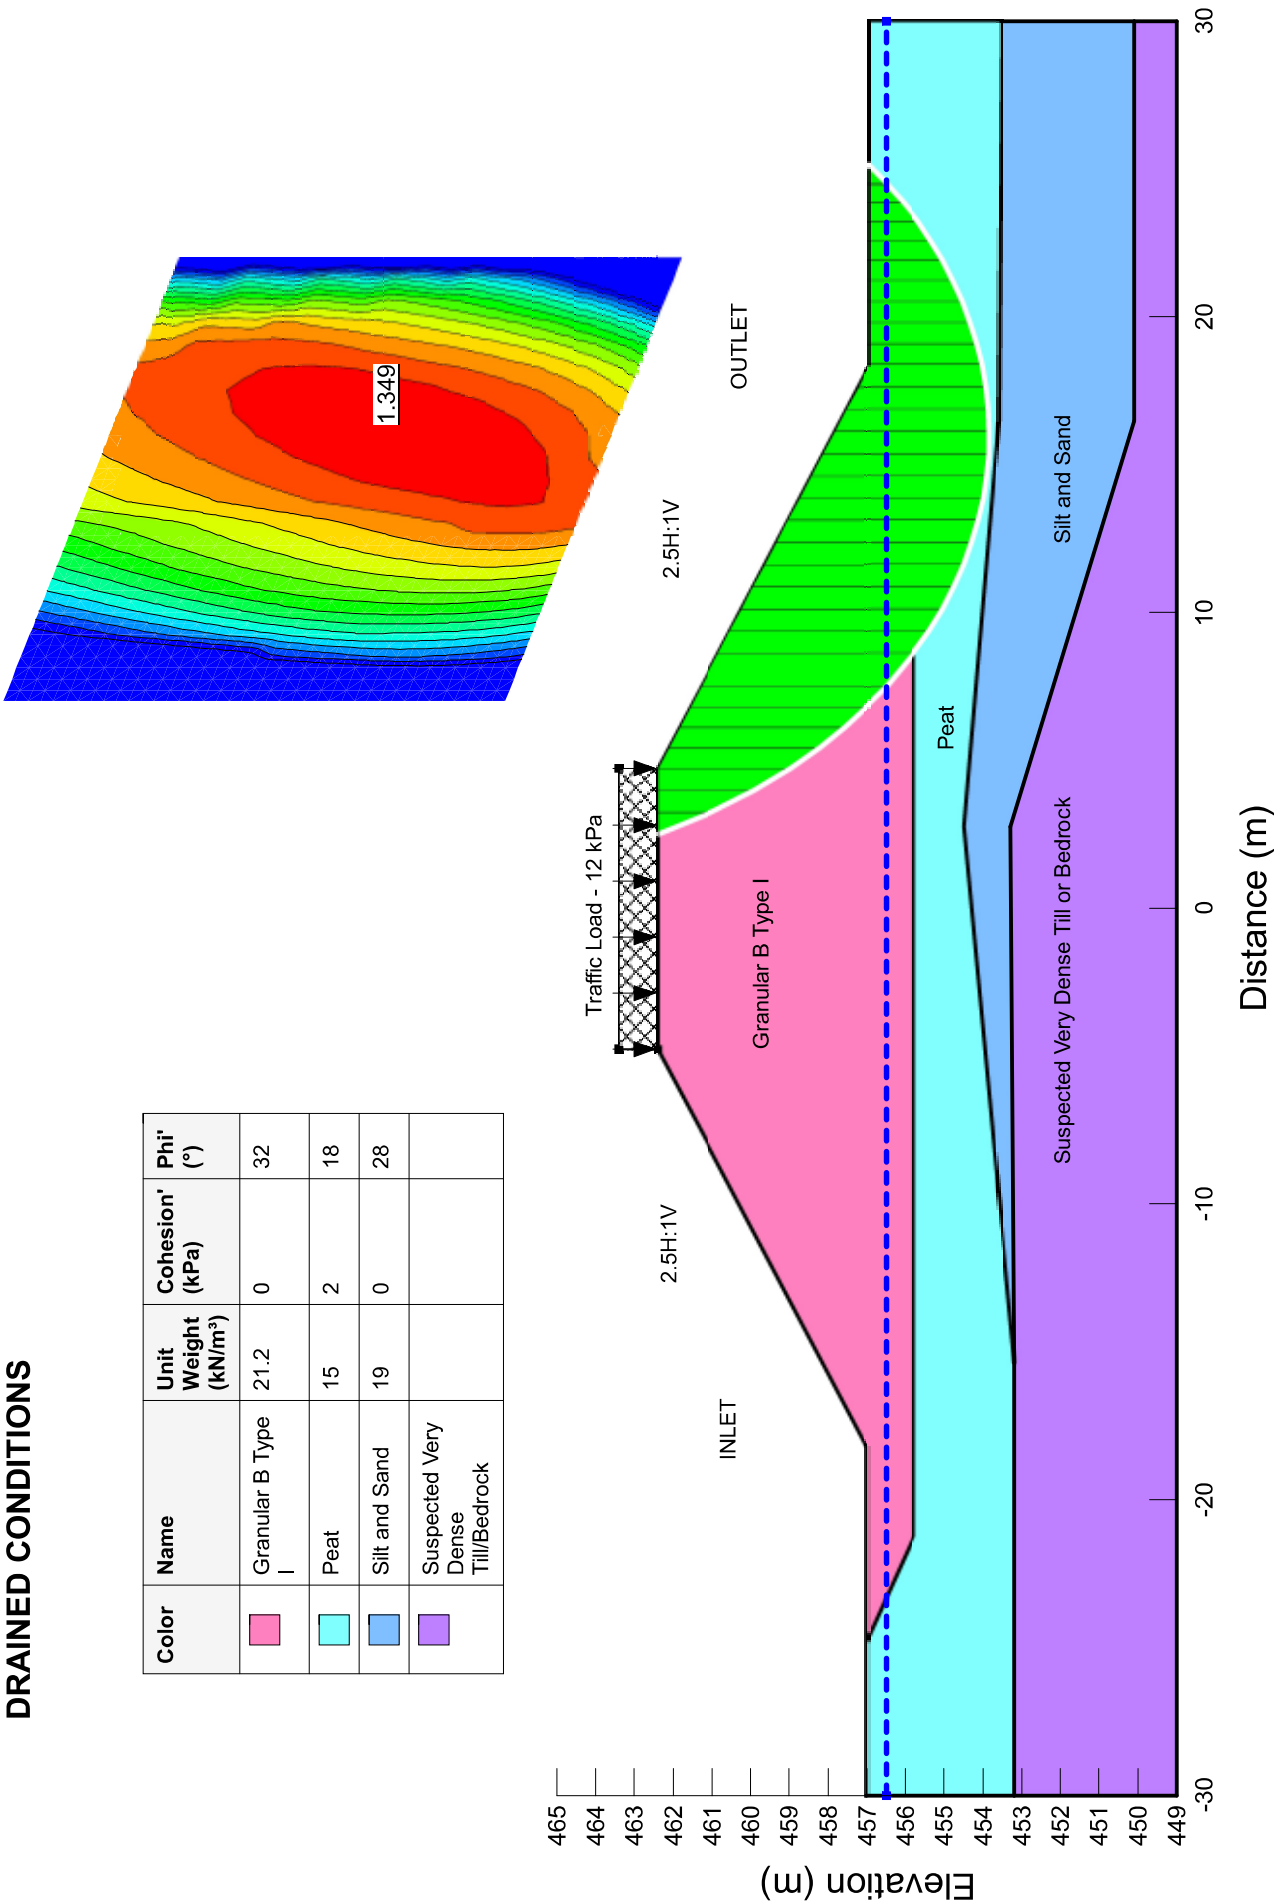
Proposed Embankment Stability - Inlet Side - 2.5H:1V Side Slopes
